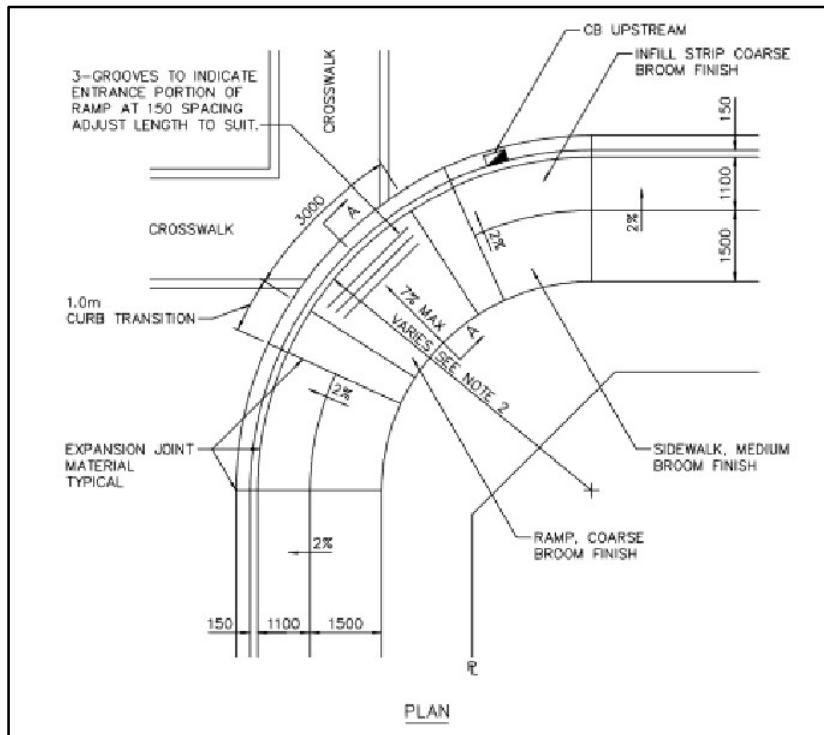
Sidewalk ramp detail from MMCD drawing, MMCD, 2019
